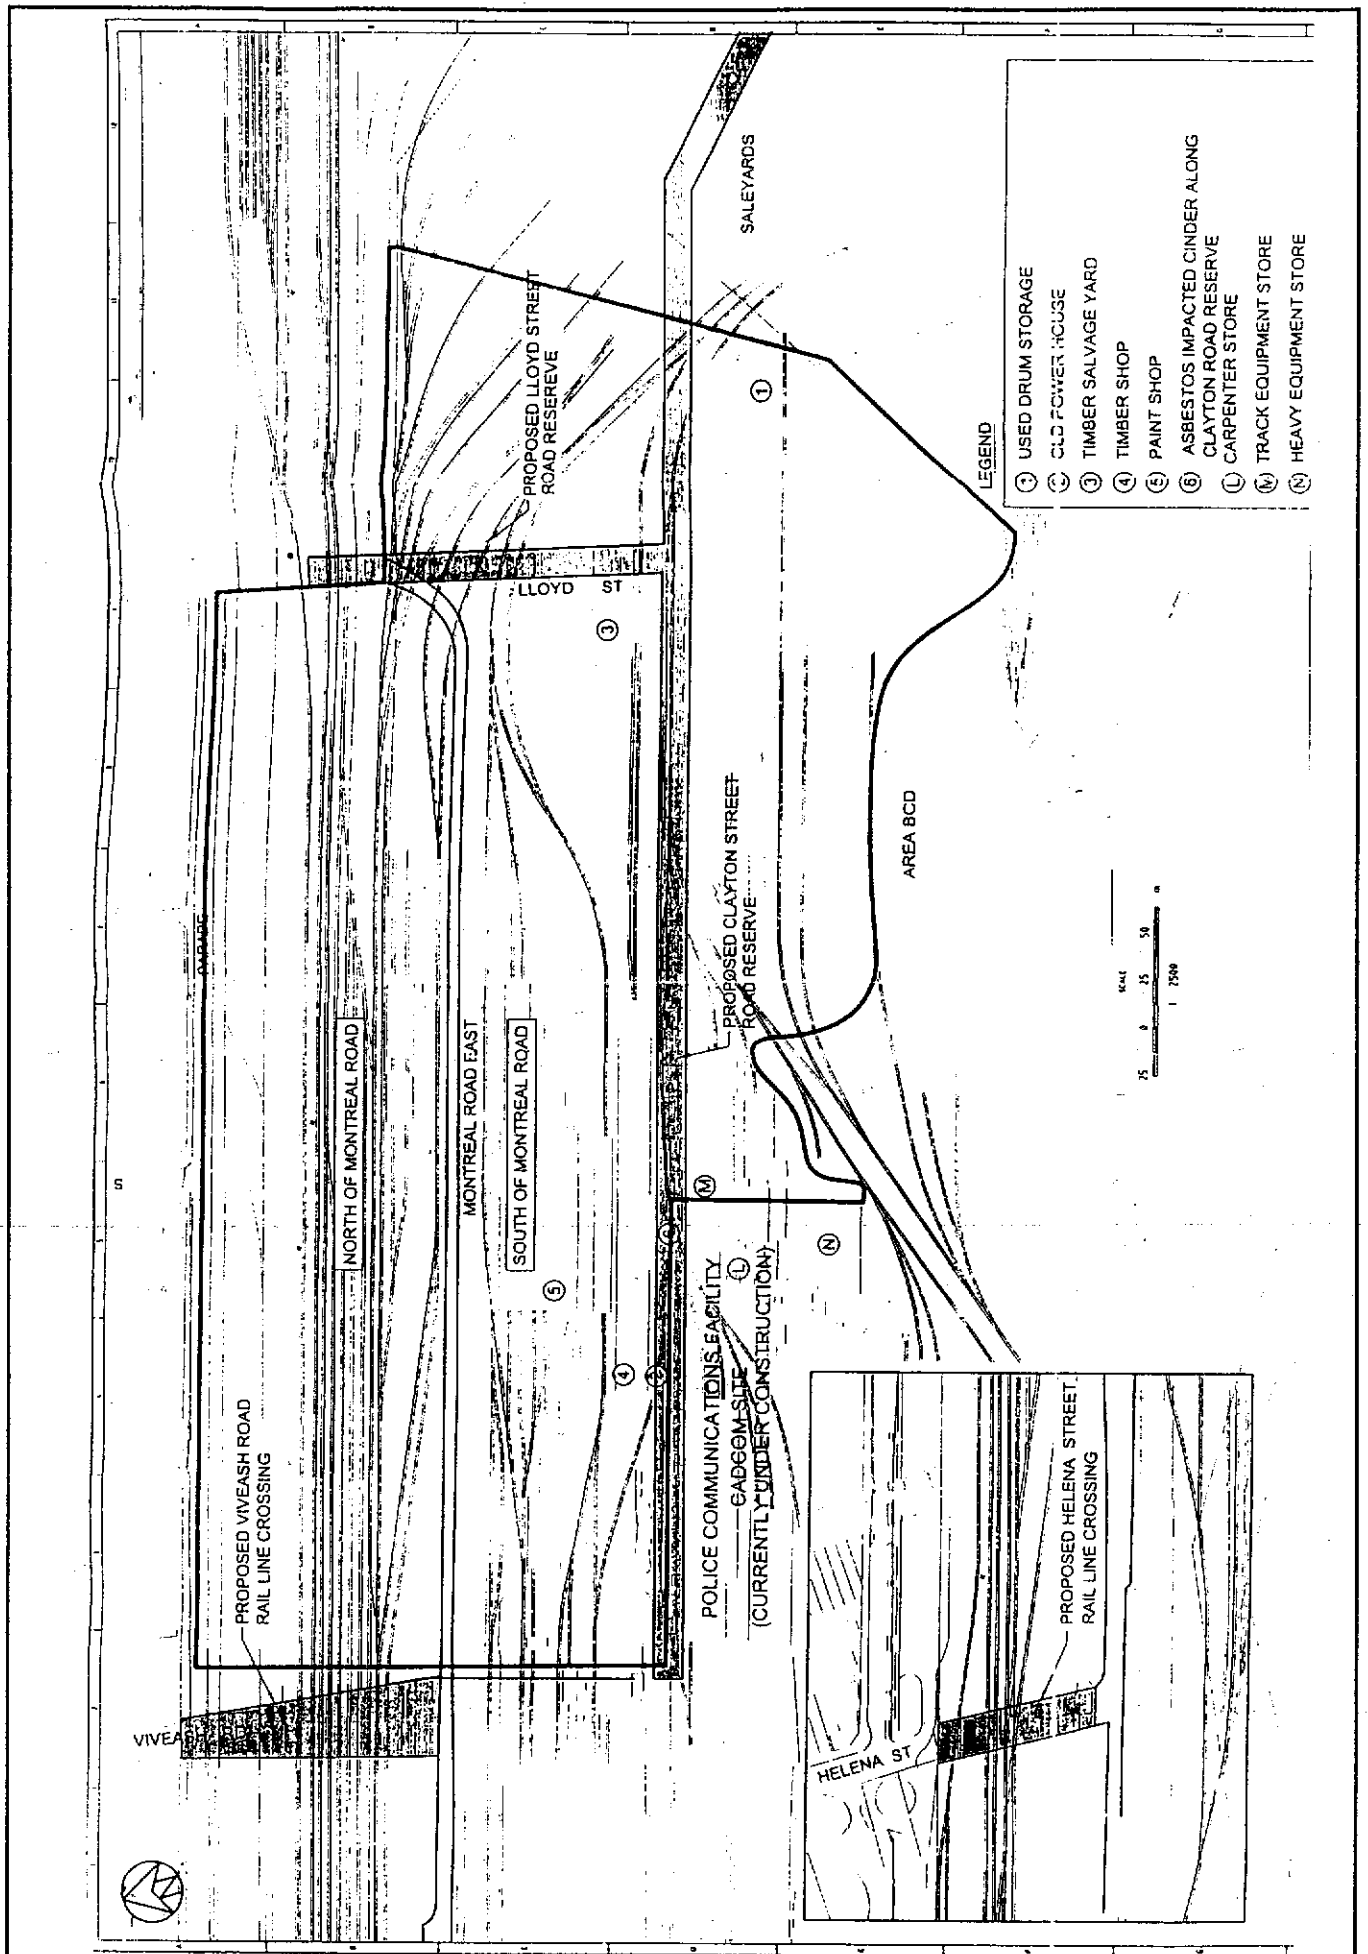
Midland Railway workshops Area E Referral Site Layout and Potential Source of Contamination.
